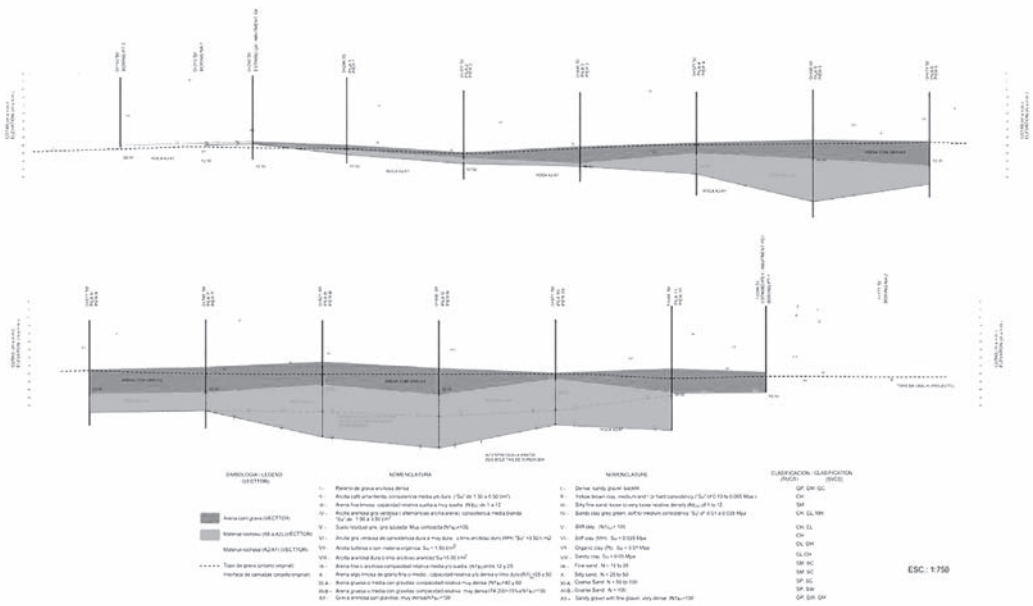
Longitudinal cross section of subsoil in the bridge's alignment.
